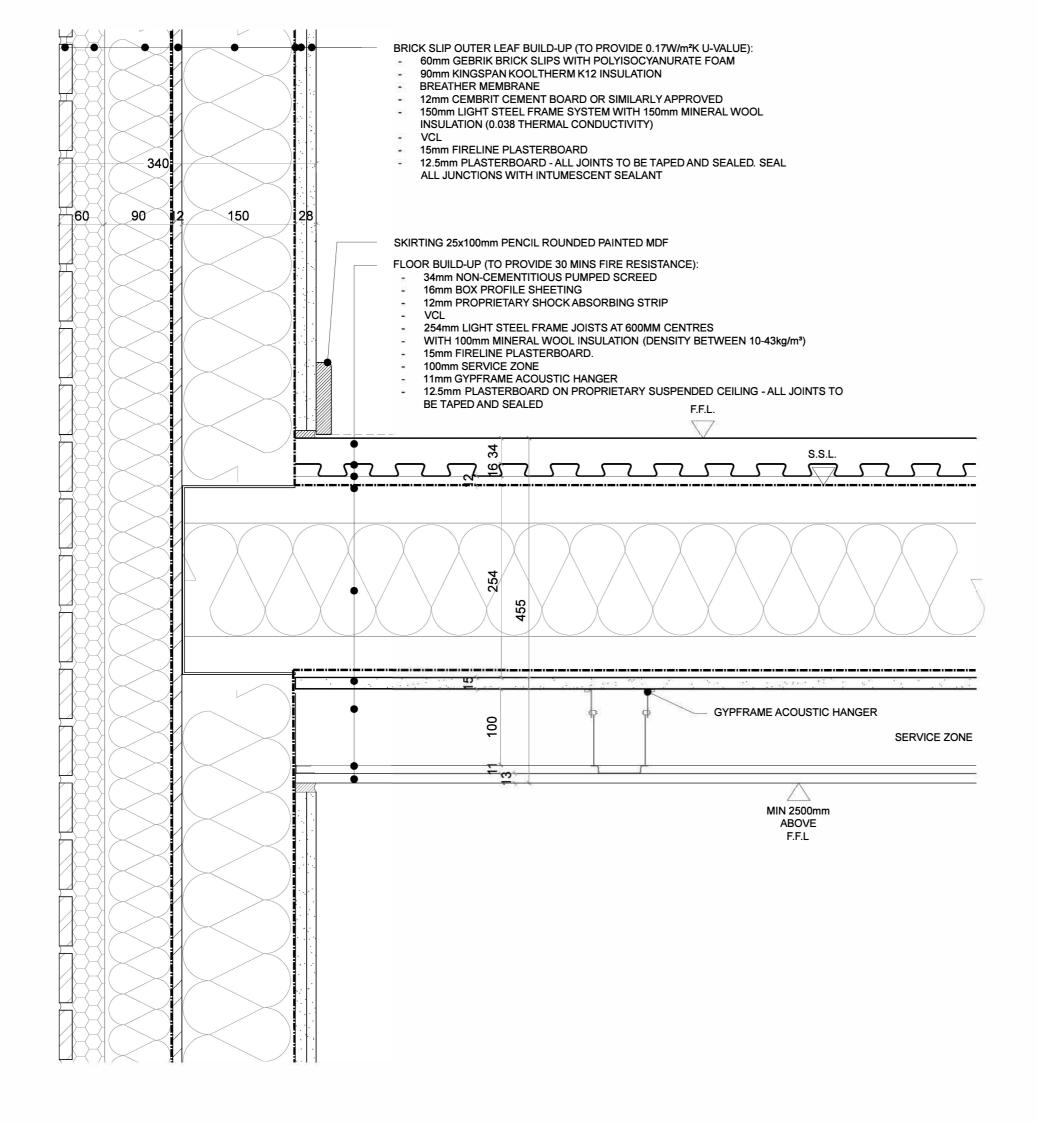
B5P EXTERNAL WALL AND FIRST FLOOR JUNCTION INSULATED BRICK SLIPS (NO CAVITY) Cad File Sheet Size Scale 1485_DETAILS SET B A3 1:5 Drawn by Drawing Date Approved by EHG AUG 2016 DW Project No. Drawing No. Revision D02B-3 В 1485
